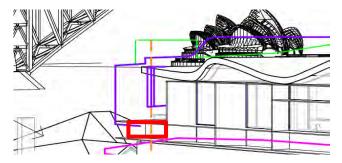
Proposed view from Unit 10/ 21 Waiwera Street
